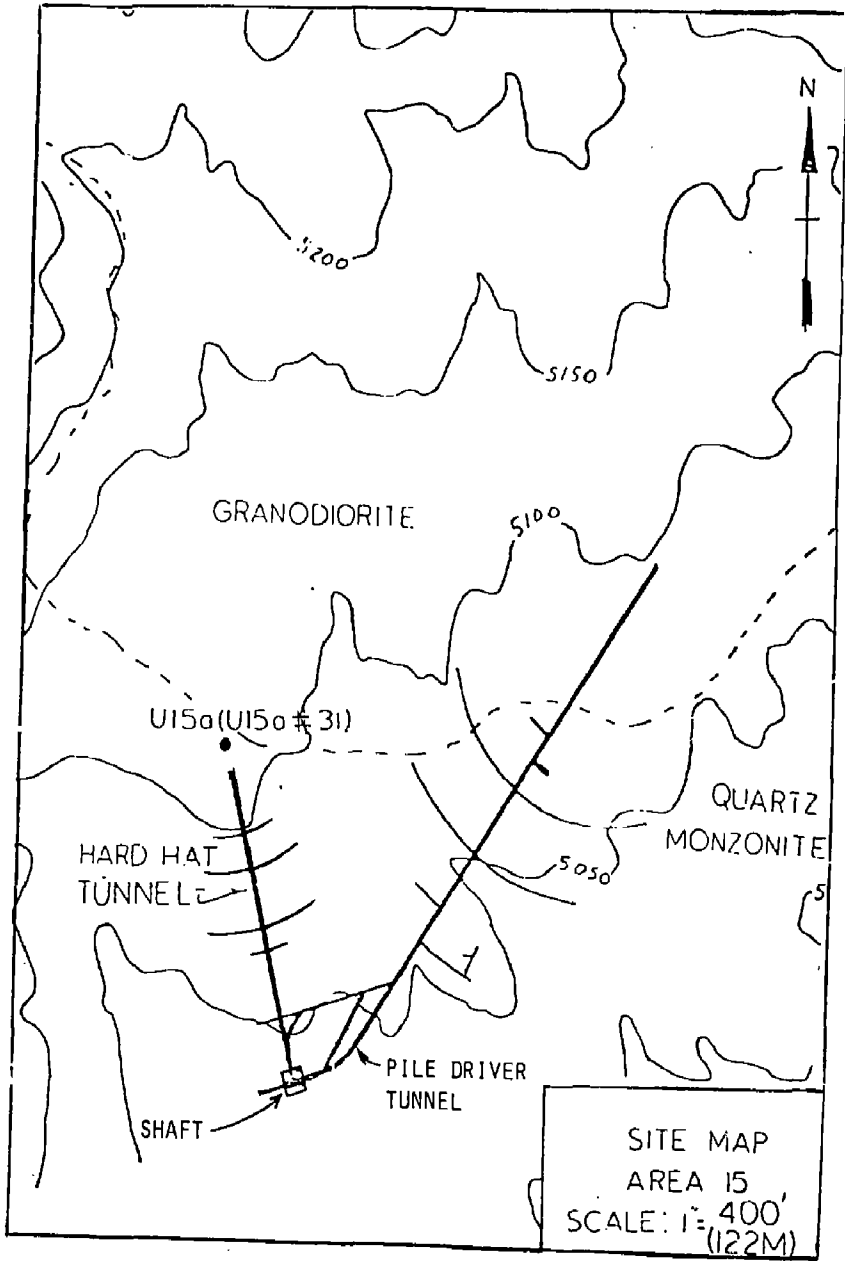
PLAN OF UNDERGROUND TUNNELS
